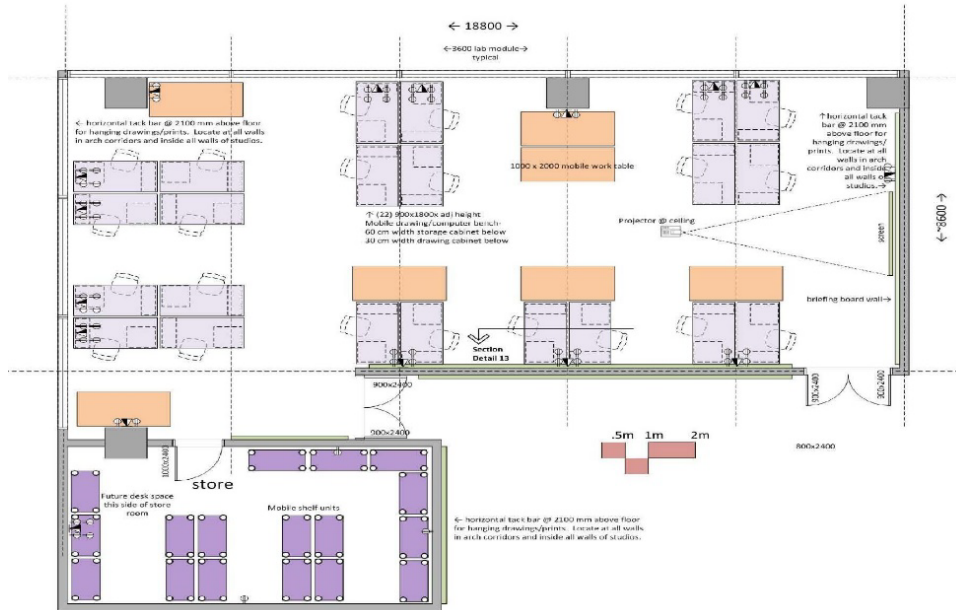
Typical layout plan of architectural design studio (not to scale)
